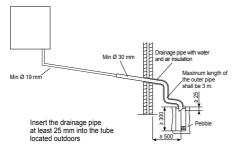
Outside Connection of Condensate Water Drainage Pipe
